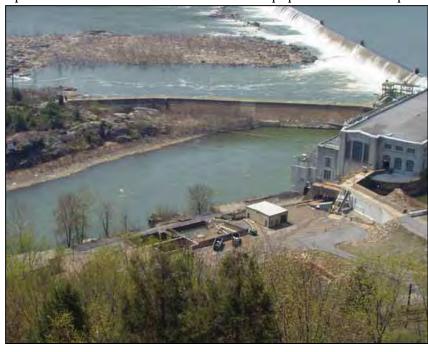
EXISTING POWERHOUSE PRE-REDEVELOPMENT
